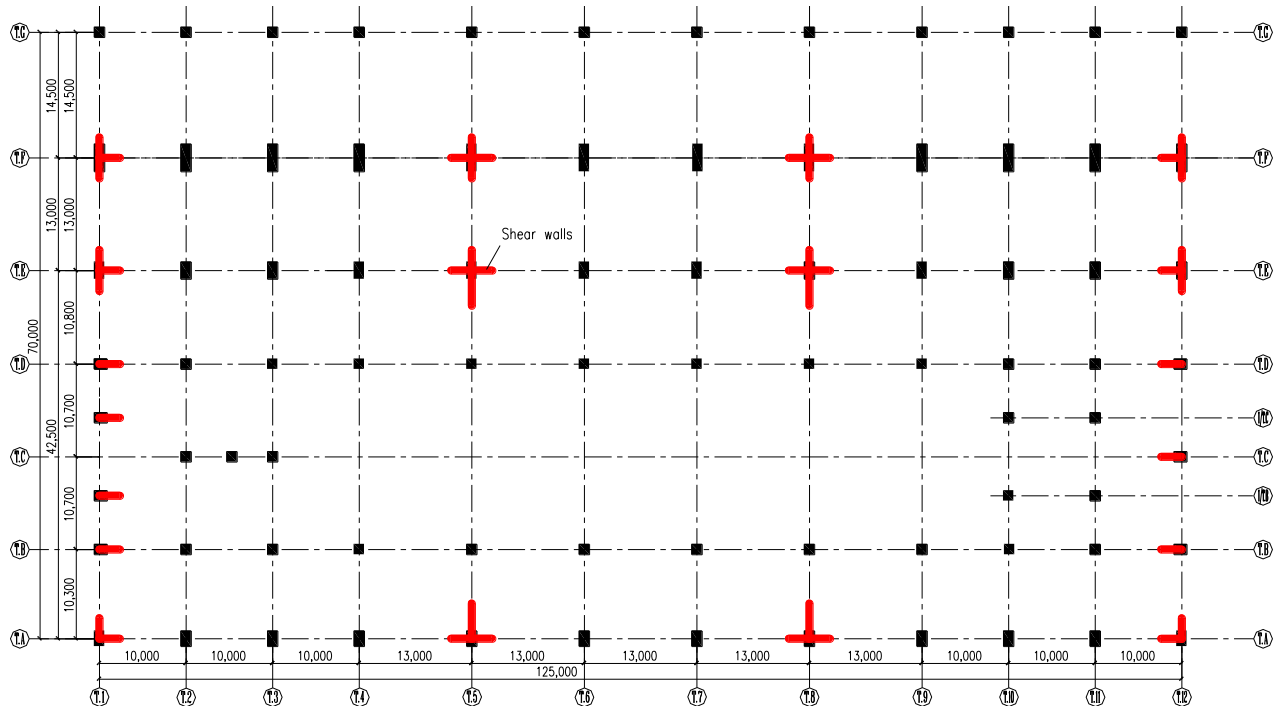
The plane layout of the main building structure of the few-wall SRC frame-bent structure.
